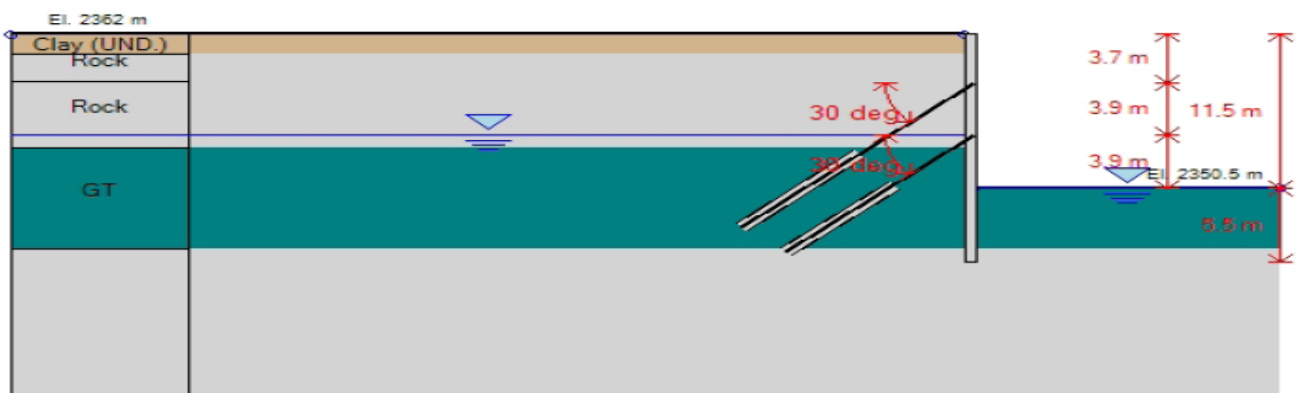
the final 3.9m excavation for 1.5 m spacing and 1<sup>ST</sup> anchor level 3.7m
